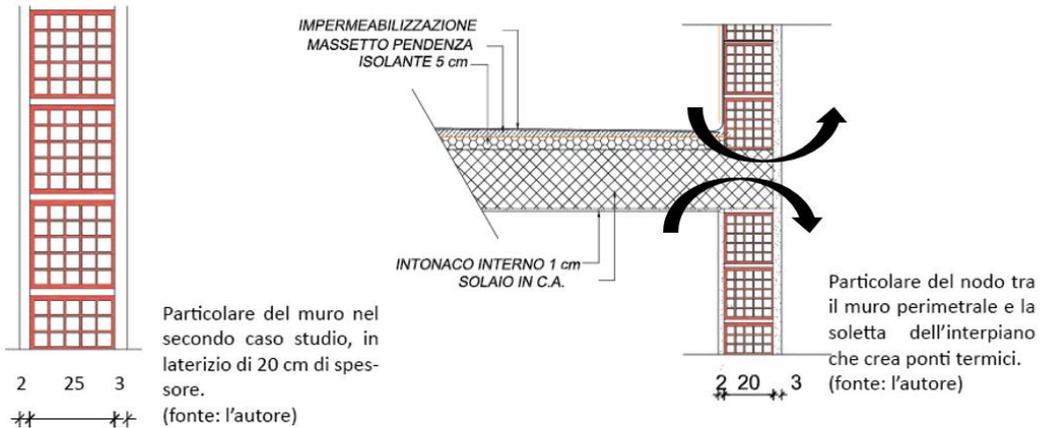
Details of the perimetral wall and the node between the perimeter wall and the intermediate floor.
